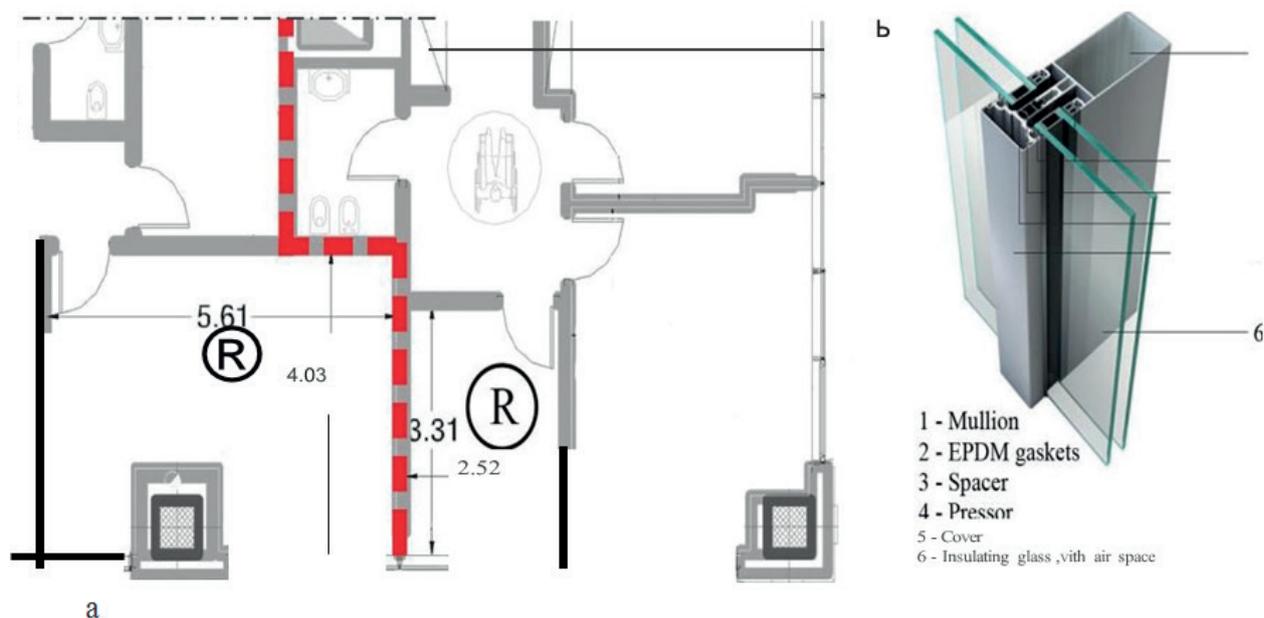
(a) Plan portion of the building under test where: S = source room, R = receiving room, dashed line is the limit of two distinct properties; (b) detail of the curtain wall structure.
